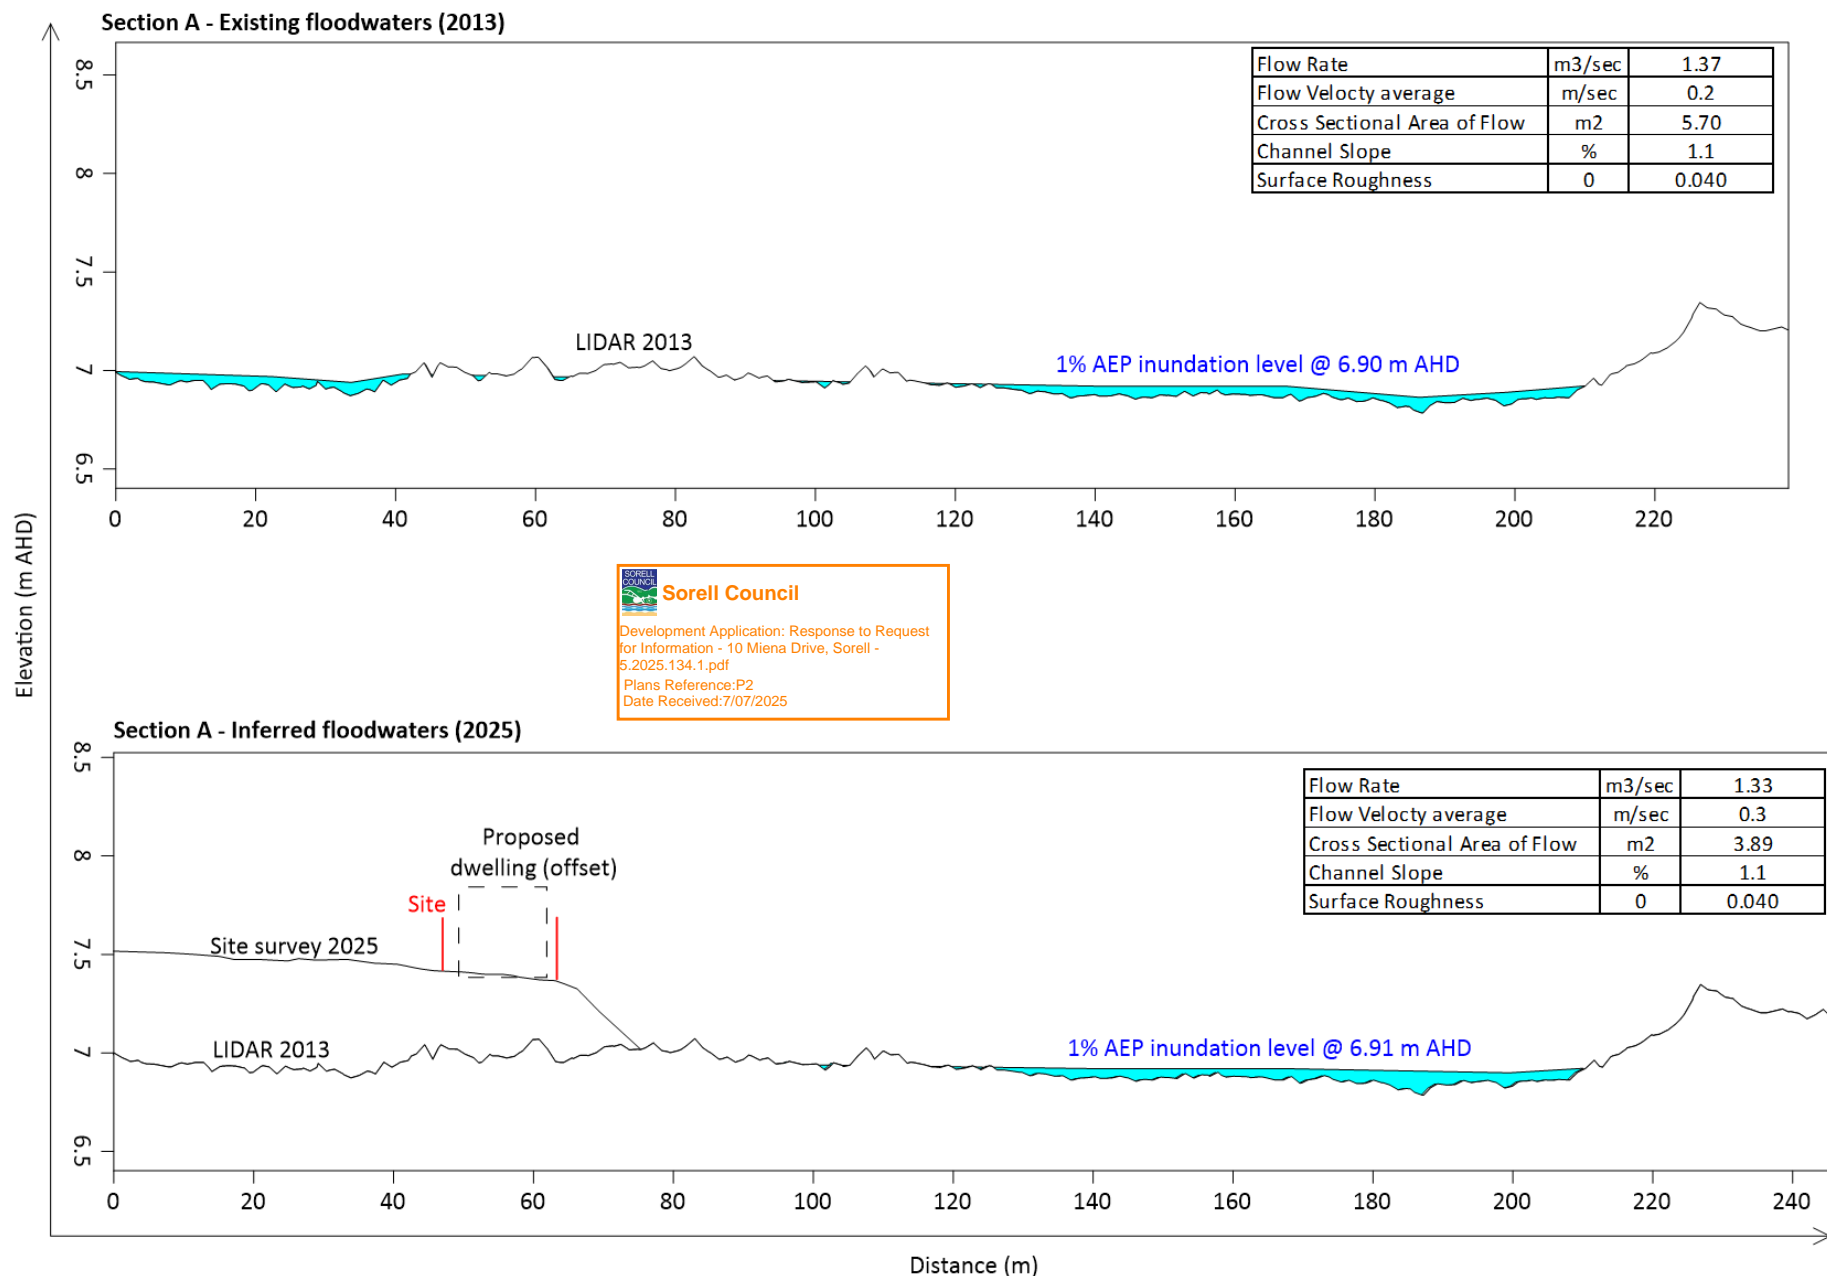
AEP Site Stormwater Flow Analysis – Cross Section A 2025 Within the Building Envelope - Drawings Are to Scale and For Conceptual Modelling Purposes Only
